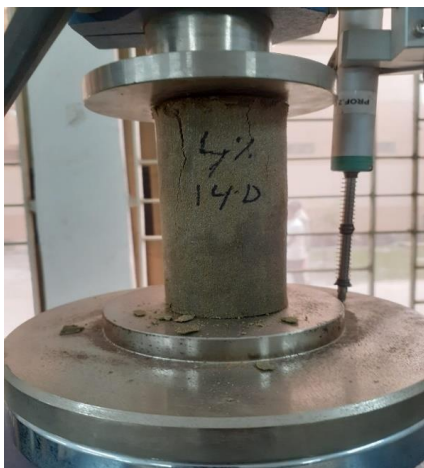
Testing the mould in UCS machine Figure 9: Failure pattern after testing the mould
